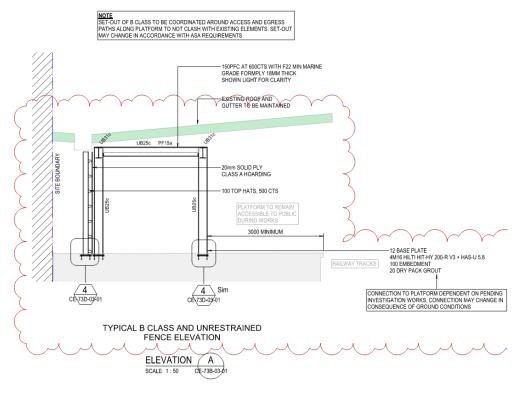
B-Class Hoarding Section – Platform 1 Central Station
